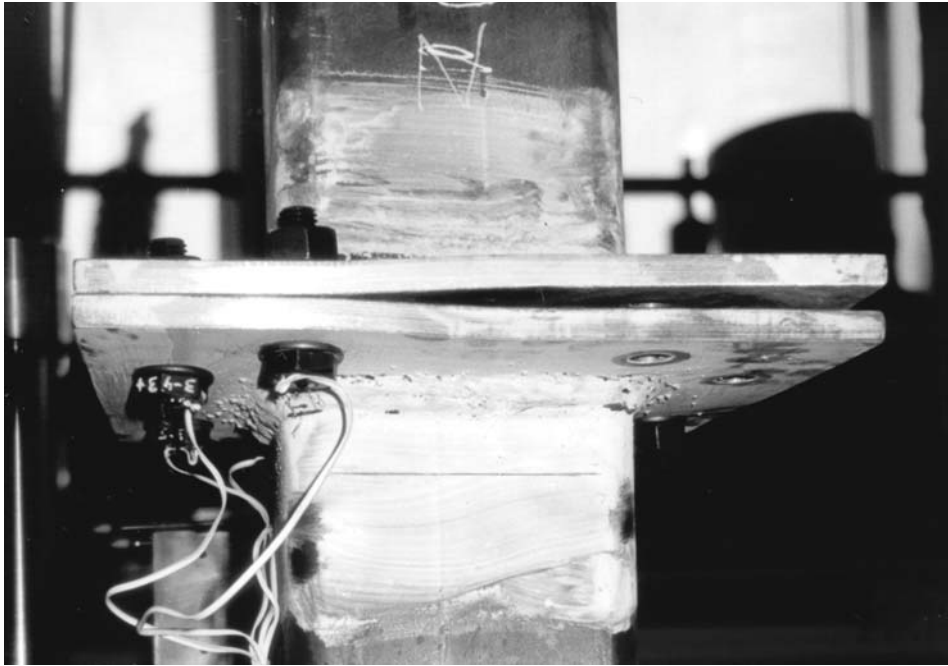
Square flange-plate connection (S8-3) with eight bolts after failure
